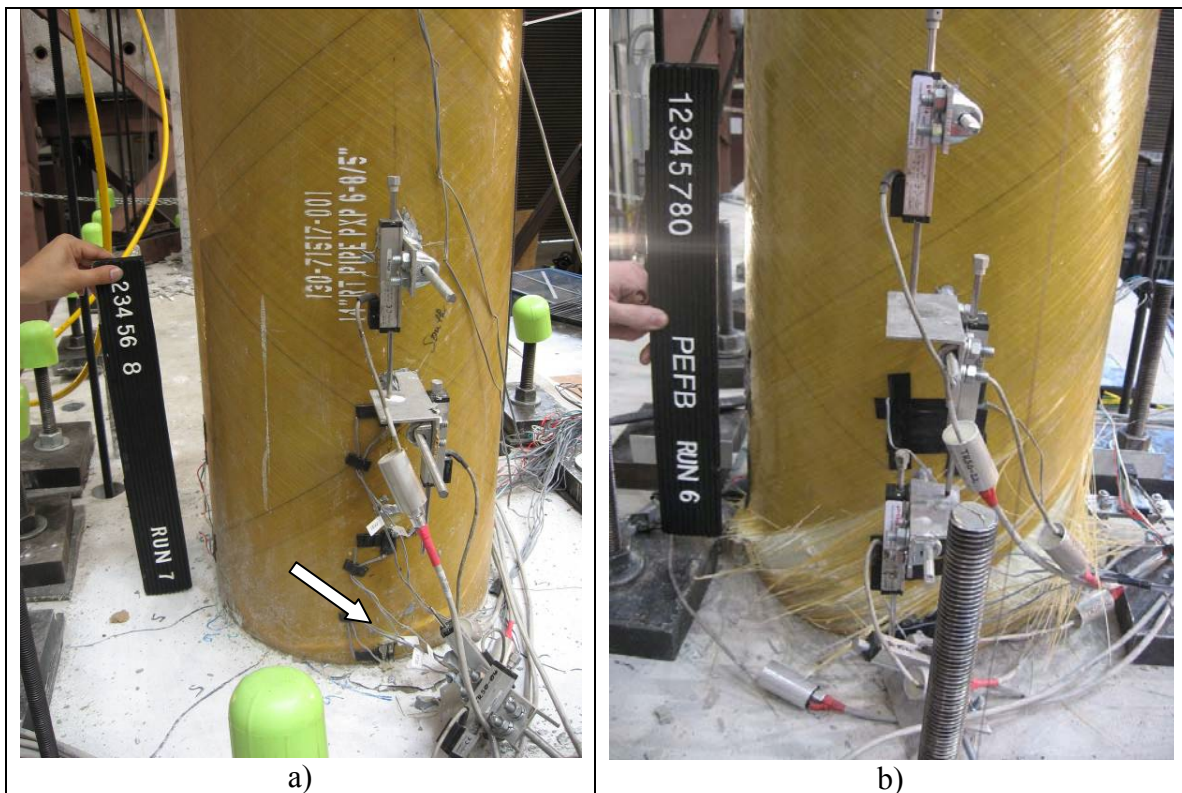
Apparent Damage at Failure Point in FRP Columns, South a) PPTC (CIS) [Zaghi and Saiidi, 2010a], b)PEFB (Precast)
